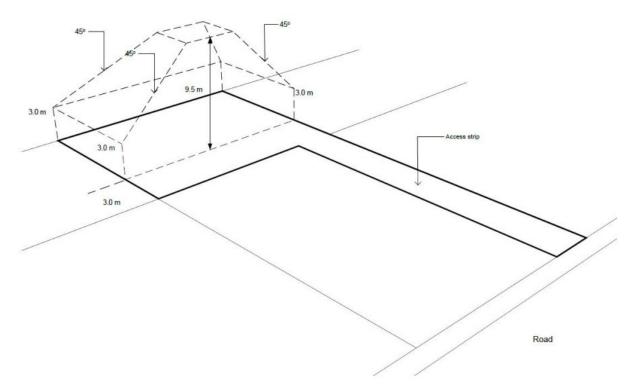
Building envelope for internal lots as required by clause 11.4.2 A3(a)
